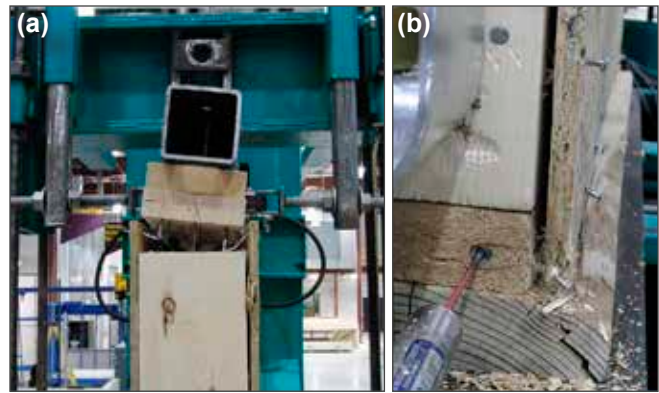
Typical failure modes. (a) Separation of top plate from OSB facings. (b) Crushing of the sill plate by the OSB facings.
